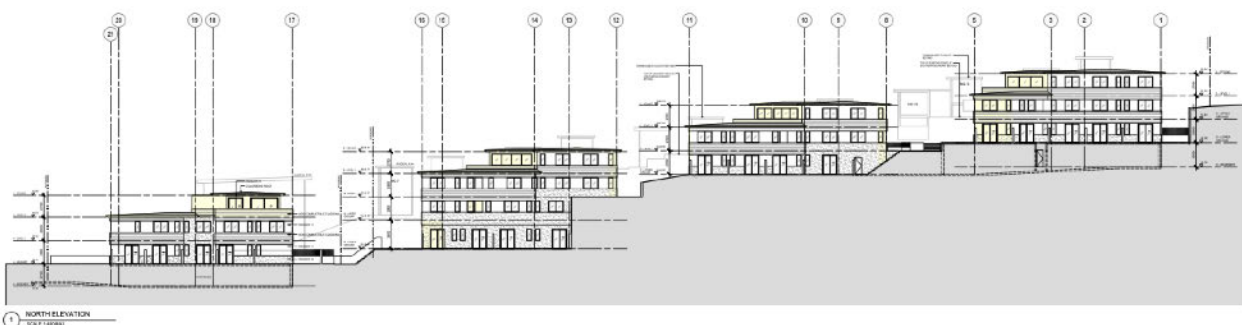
North Elevation proposed under current modification application demonstrating at least three and up to four storey presentations across all buildings
